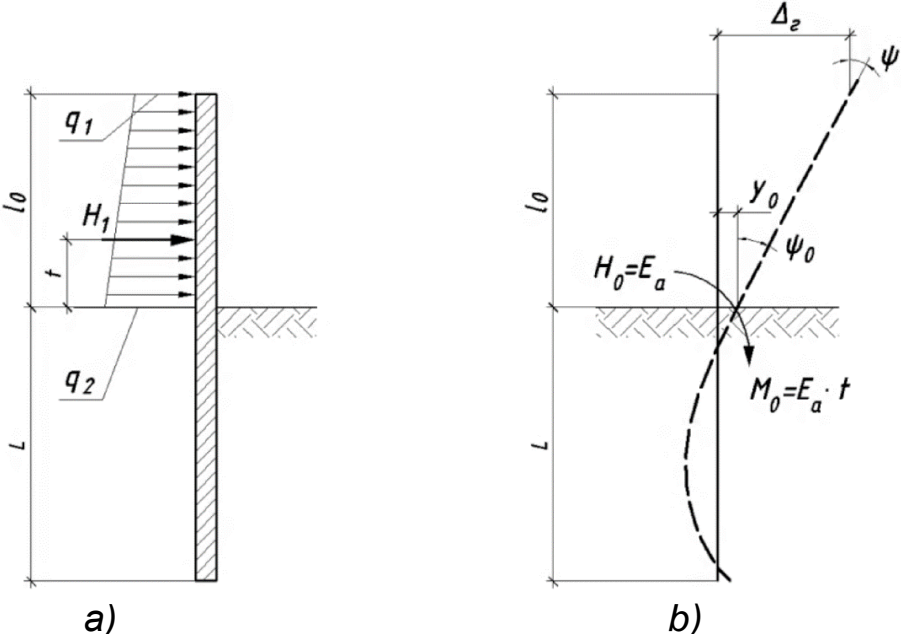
Scheme of piles in single-row variant of the retaining wall.
